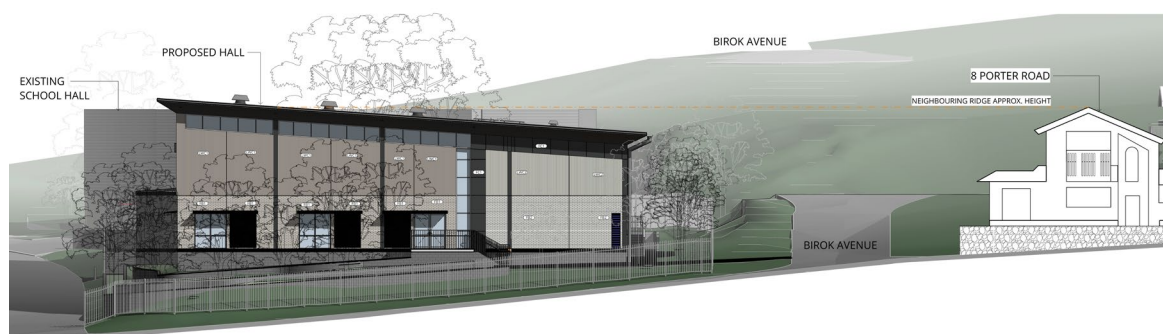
Porter Road elevation of the proposed multi-purpose hall
